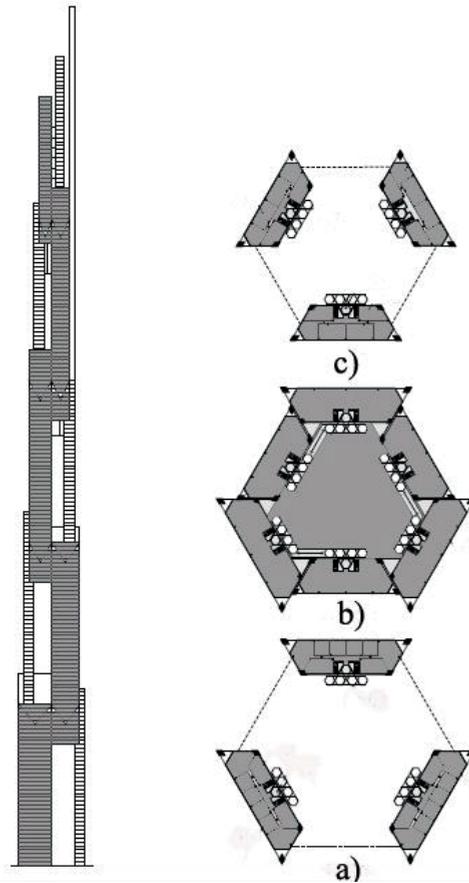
Sky Mile Tower: floor plans (a) 1-35 floors; b) 36-40 floors; c) 41-75 floors) and section, developed by authors [3]
